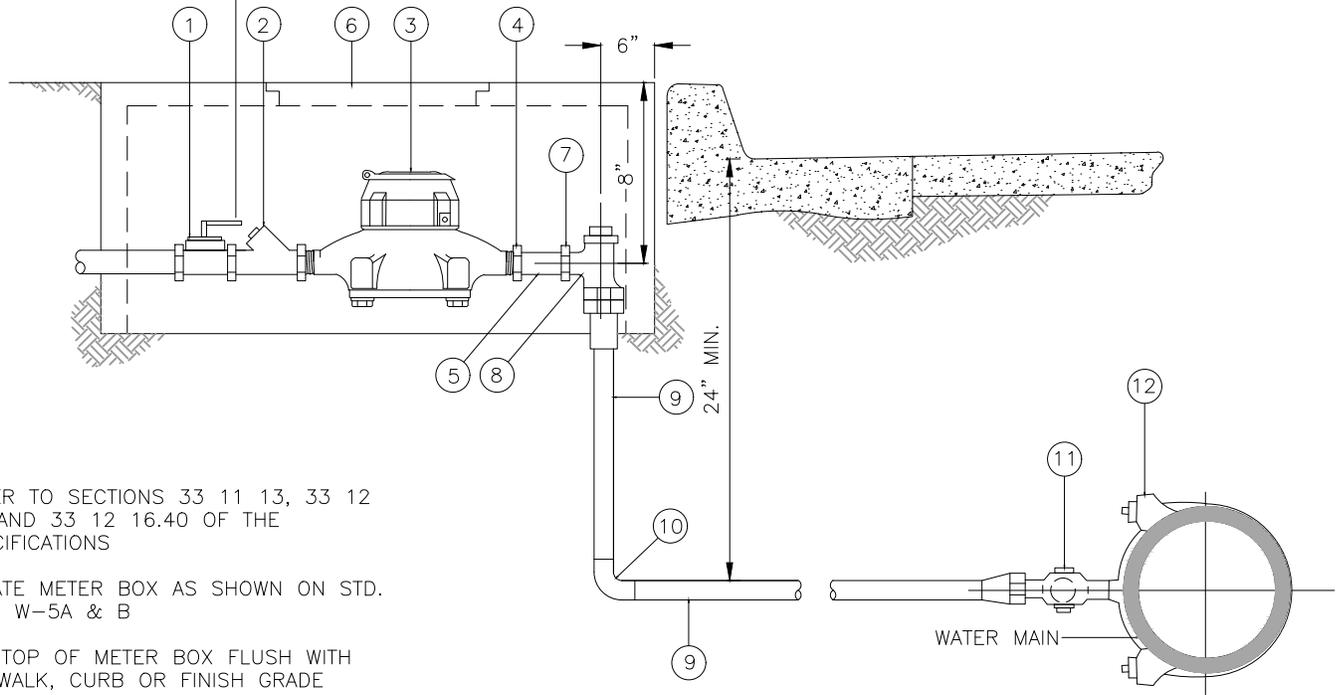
" SERVICE CONNECTION AND METER INSTALLATION
